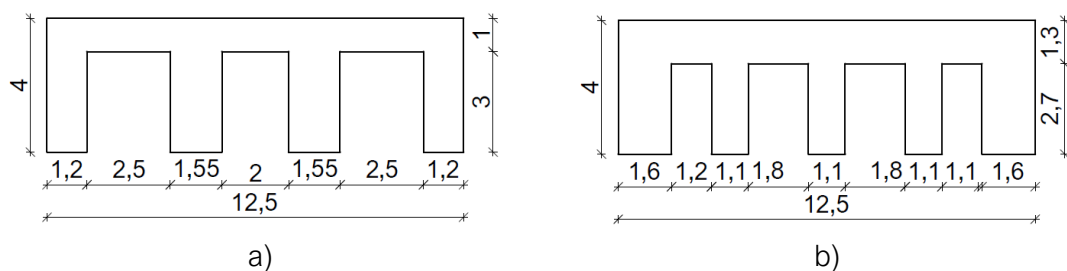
Geometry of the ground floor façade openings of the reference model: a) front façade and b) rear façade.
